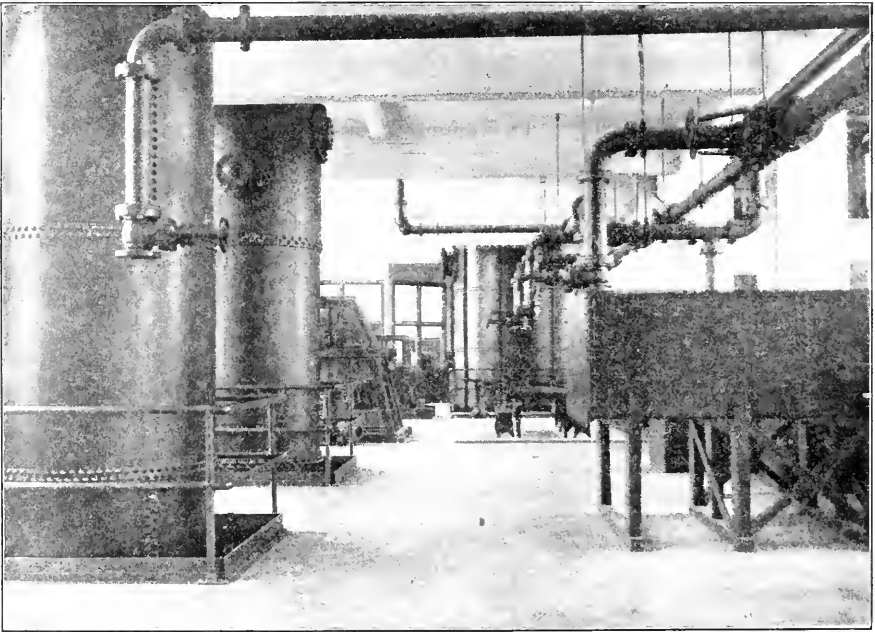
PRESSURE TANKS AND WEIR BOXES ON SECOND FLOOR.
